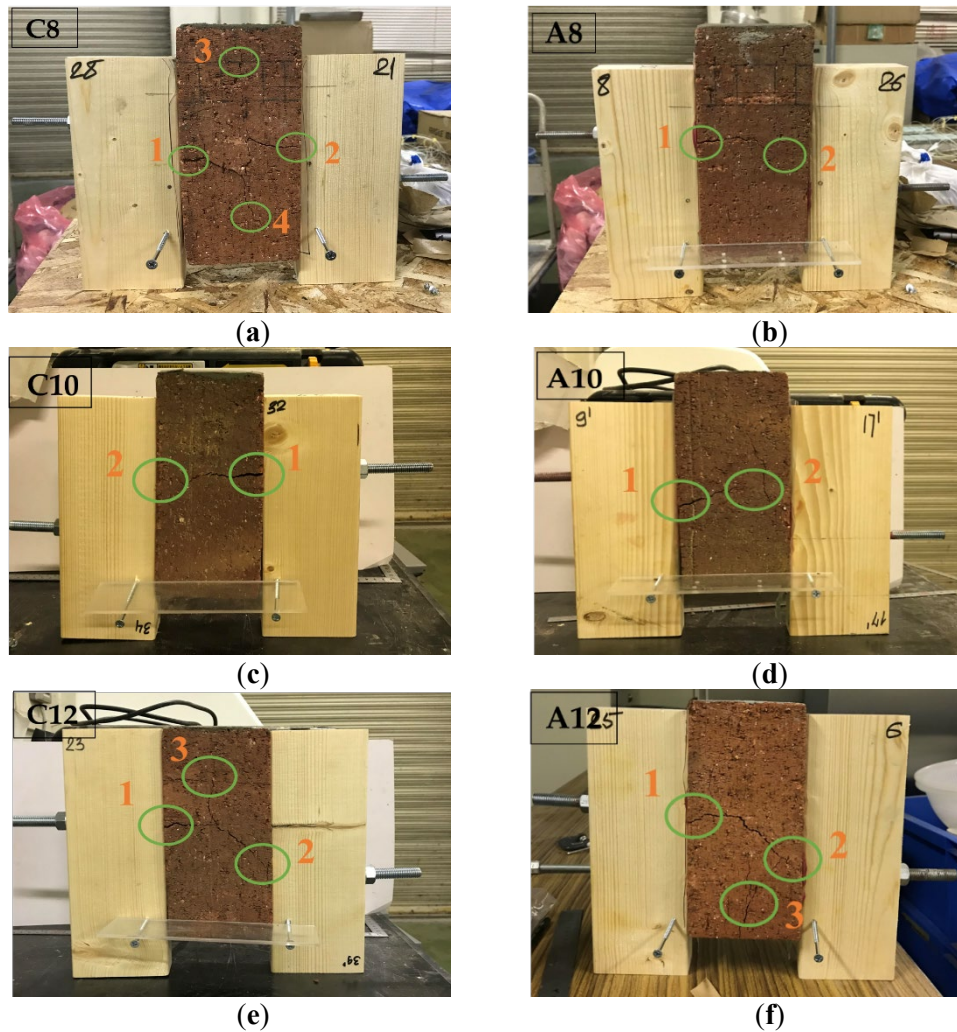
Crack on brick (main member). (a) N8-1 specimen; (b) A8-1 specimen; (c) N10-2 specimen; (d) A10-2 specimen; (e) N12-3 specimen; (f) A12-2 specimen.
